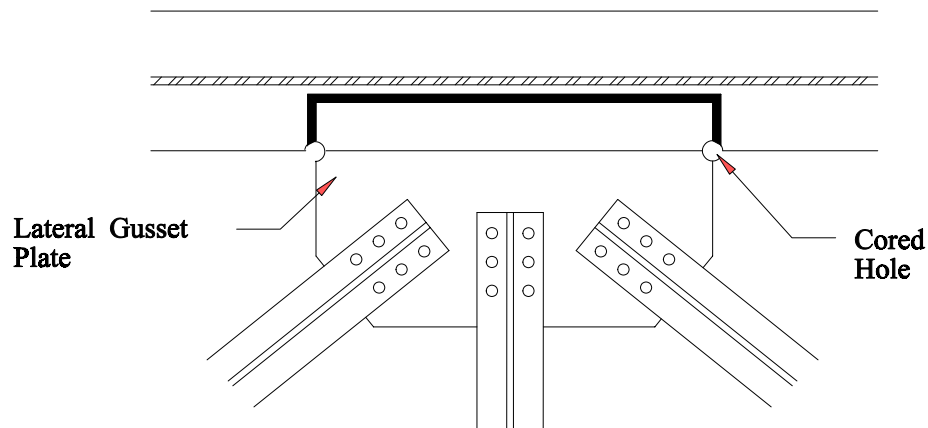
Cored holes located at cracked lateral gussets welded to flanges.
